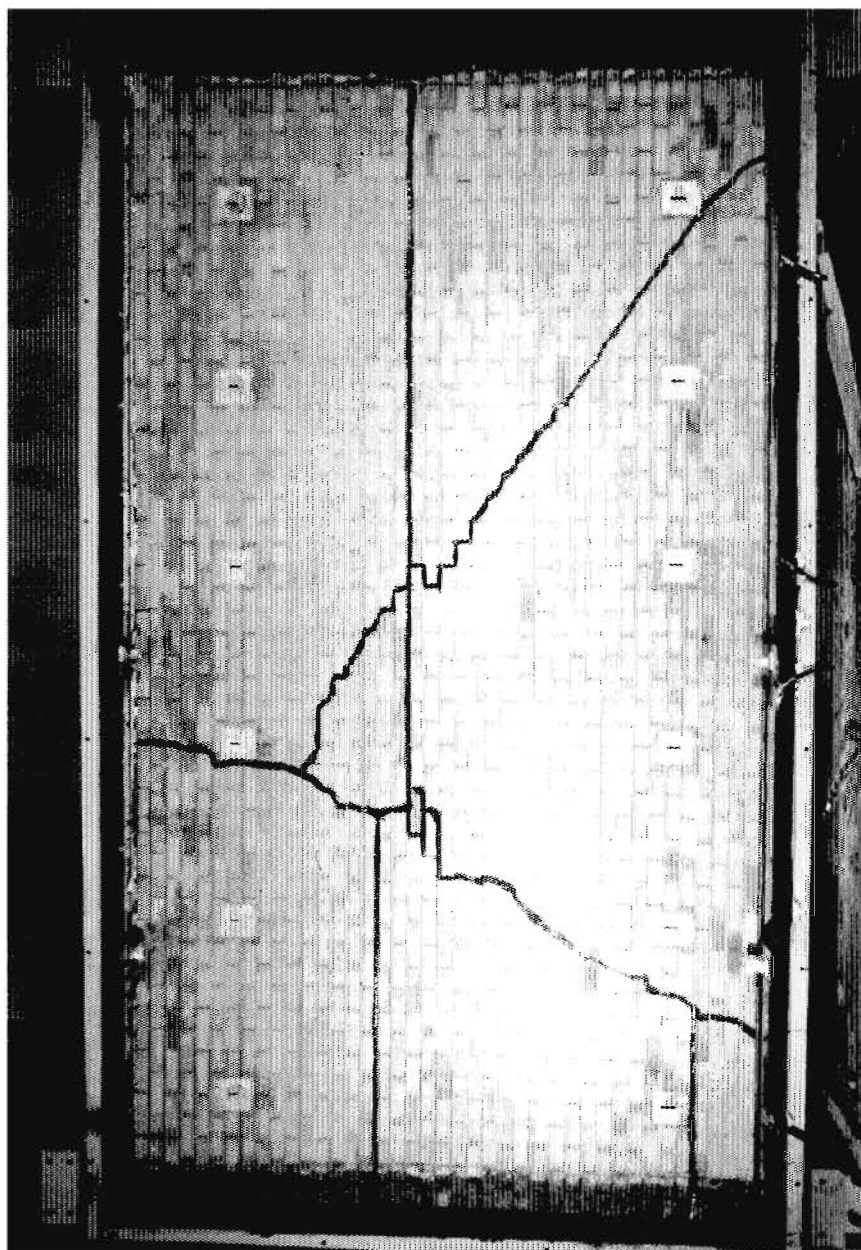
CRACK PATTERN AT FAILURE – WALL2
